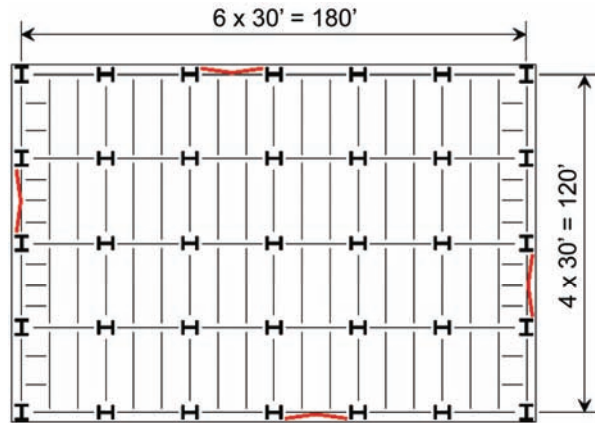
Typical plan configuration of special SCBF and BRBF archetypes (design for 3-story and 6-story configurations shown).
